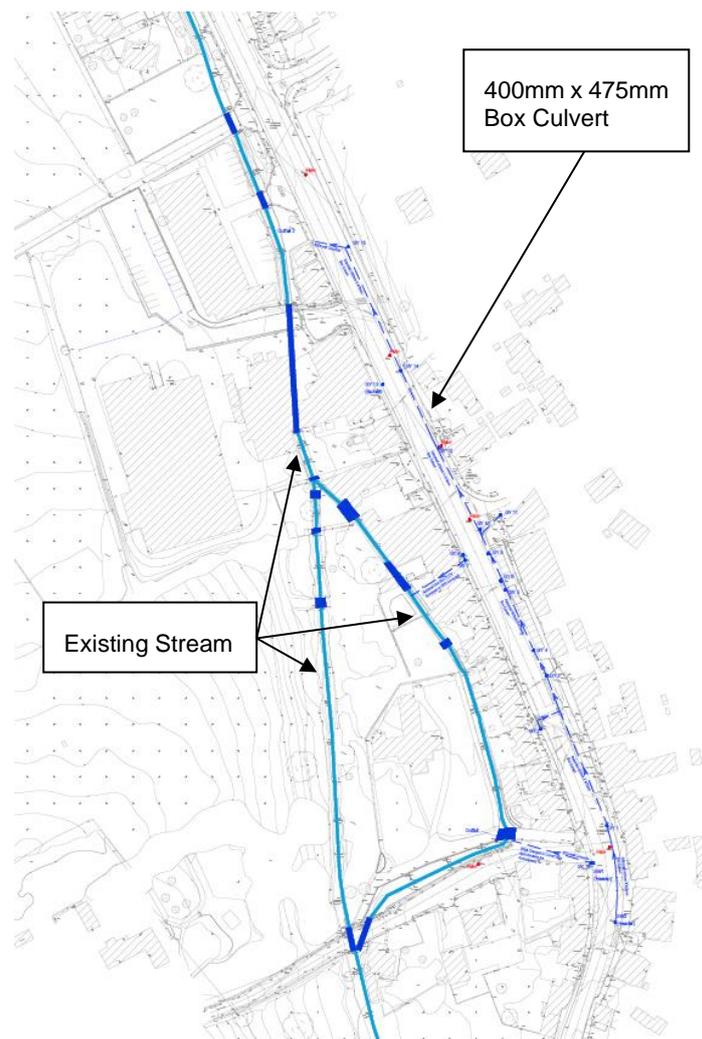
Existing Surface Water Drainage Infrastructure
